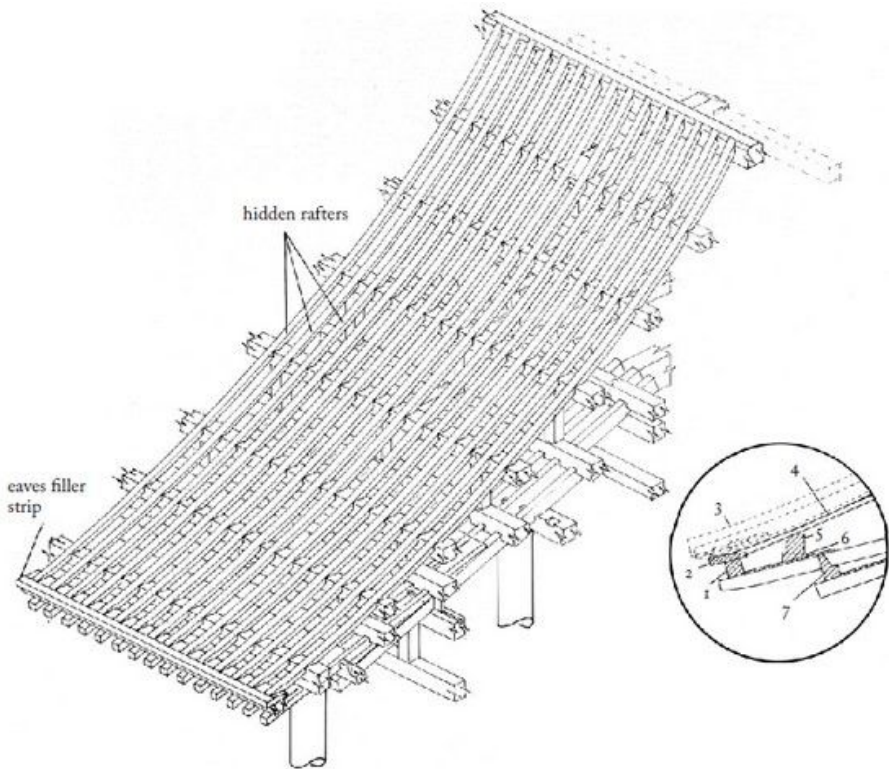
The completed hidden rafter structure. The inset shows a detail of the edge of the eaves: 1. eaves support; 2. eaves filler strip; 3. tiles; 4. hidden rafter; 5. roof purlin; 6. hold-down beam; 7. upper rafter support.
